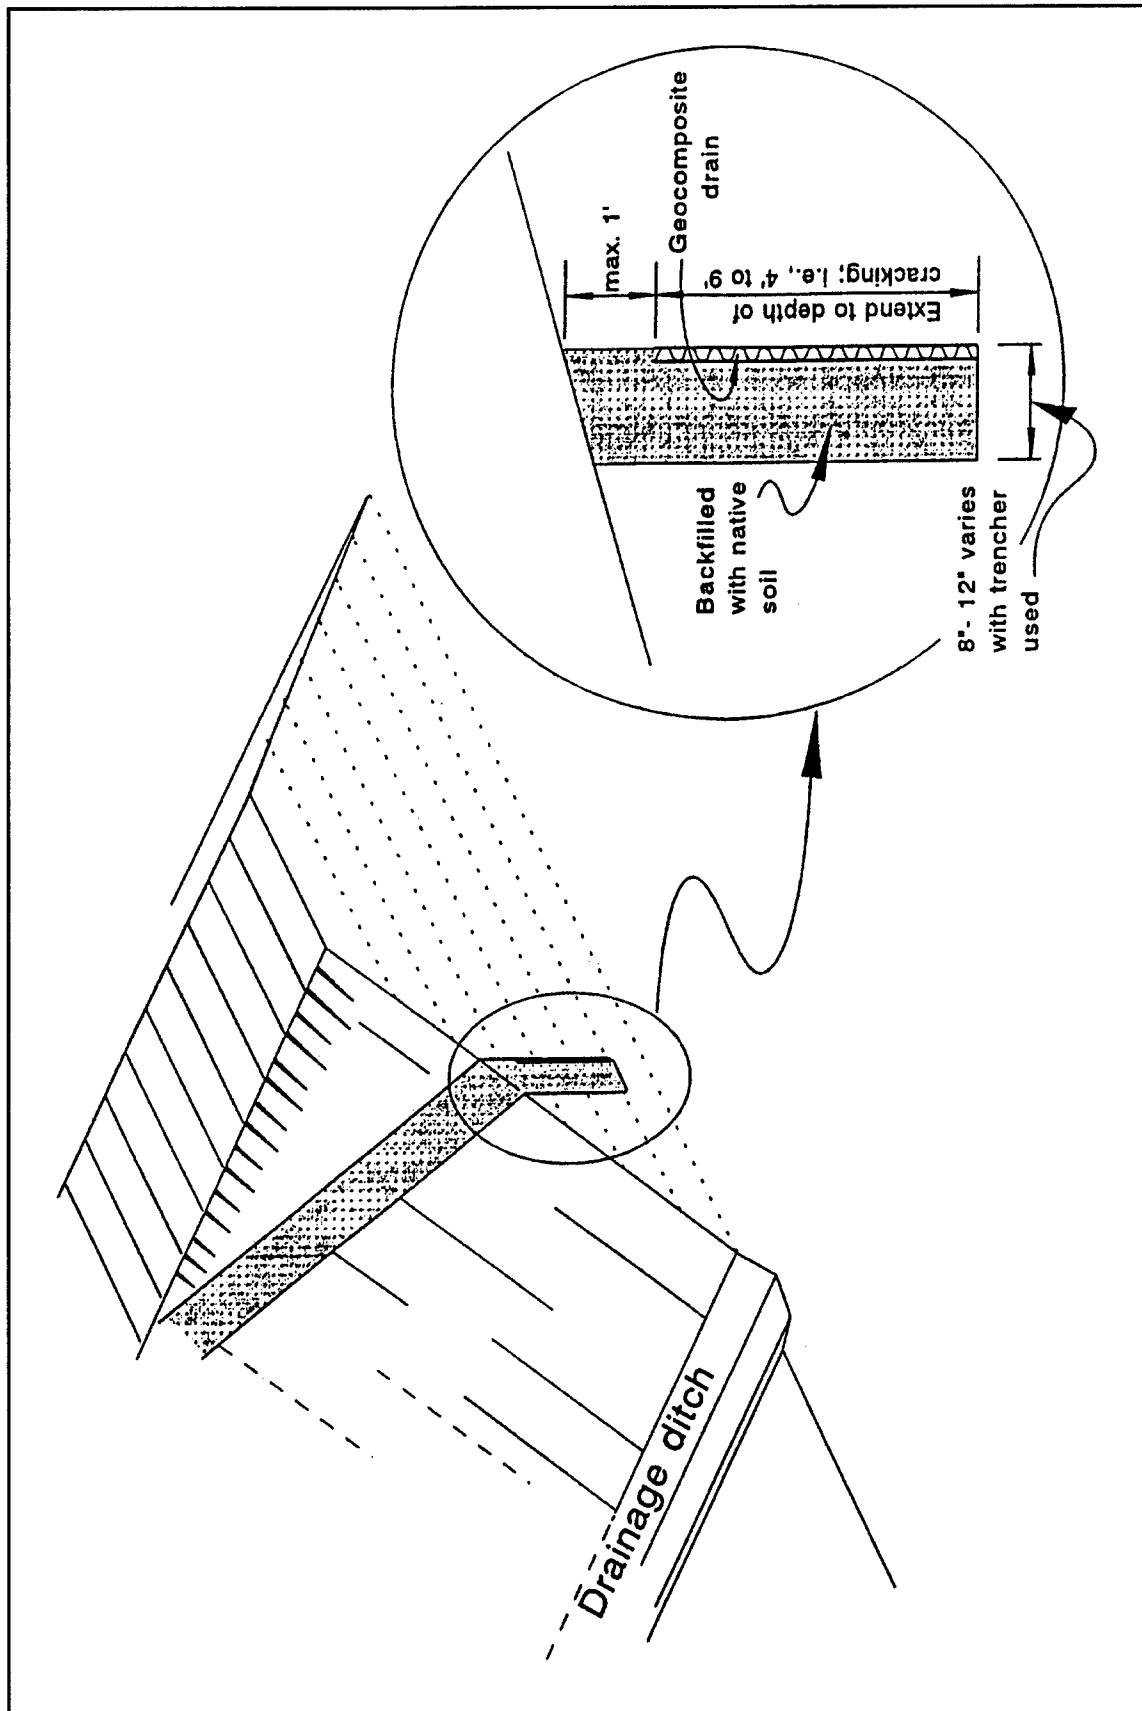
Schematic view of a geocomposite drain installed as an interceptor to remove water from the cracked upper zone of a levee (from Leshchinsky 1996)
